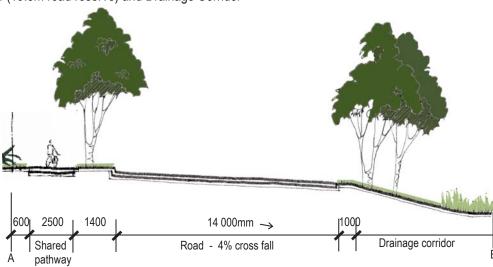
SECTION 6: Road 4 (23m road reserve)
